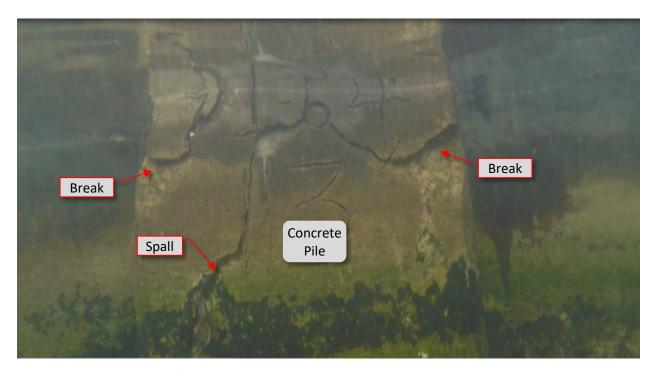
P25. STA 4+44. Breaks/spalls at both flanges at pile. Loss of concrete. Honeycomb area. Underwater view.
